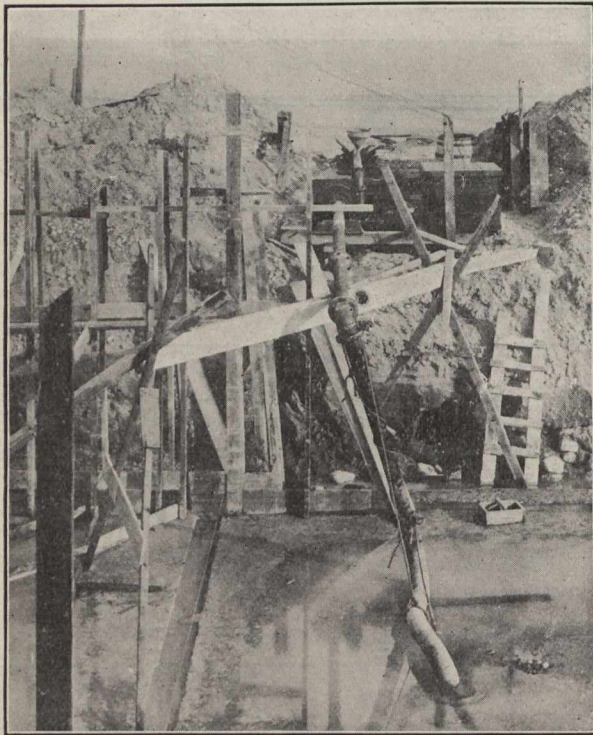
Pump Arranged with Suction Pipe in Sump, so as to Keep Down the Ground Water During Construction.
